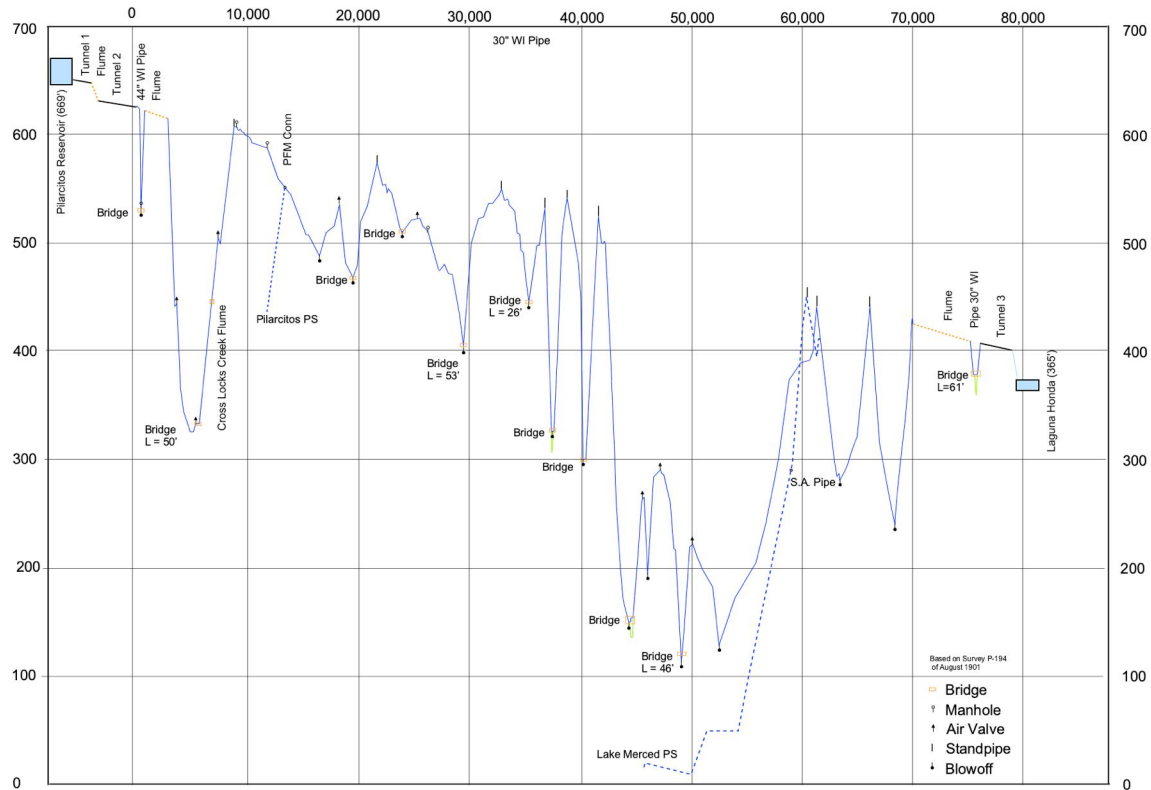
Pilarcitos Conduit Profile (Adapted from drawings P-189, P-194, 1901-1902)
